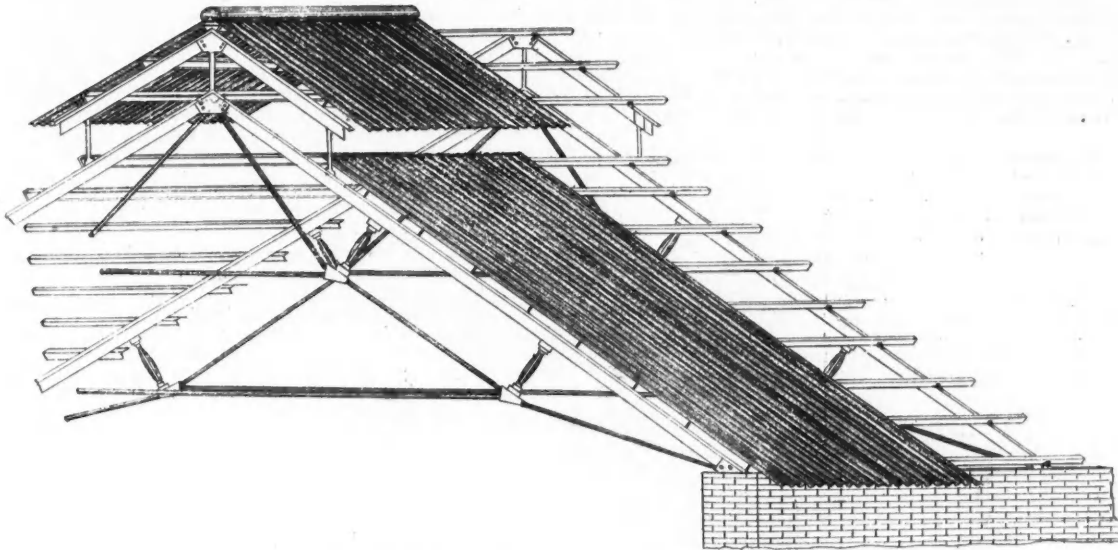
APPLICATIONS OF SHEET ZINC FOR ROOFING.
